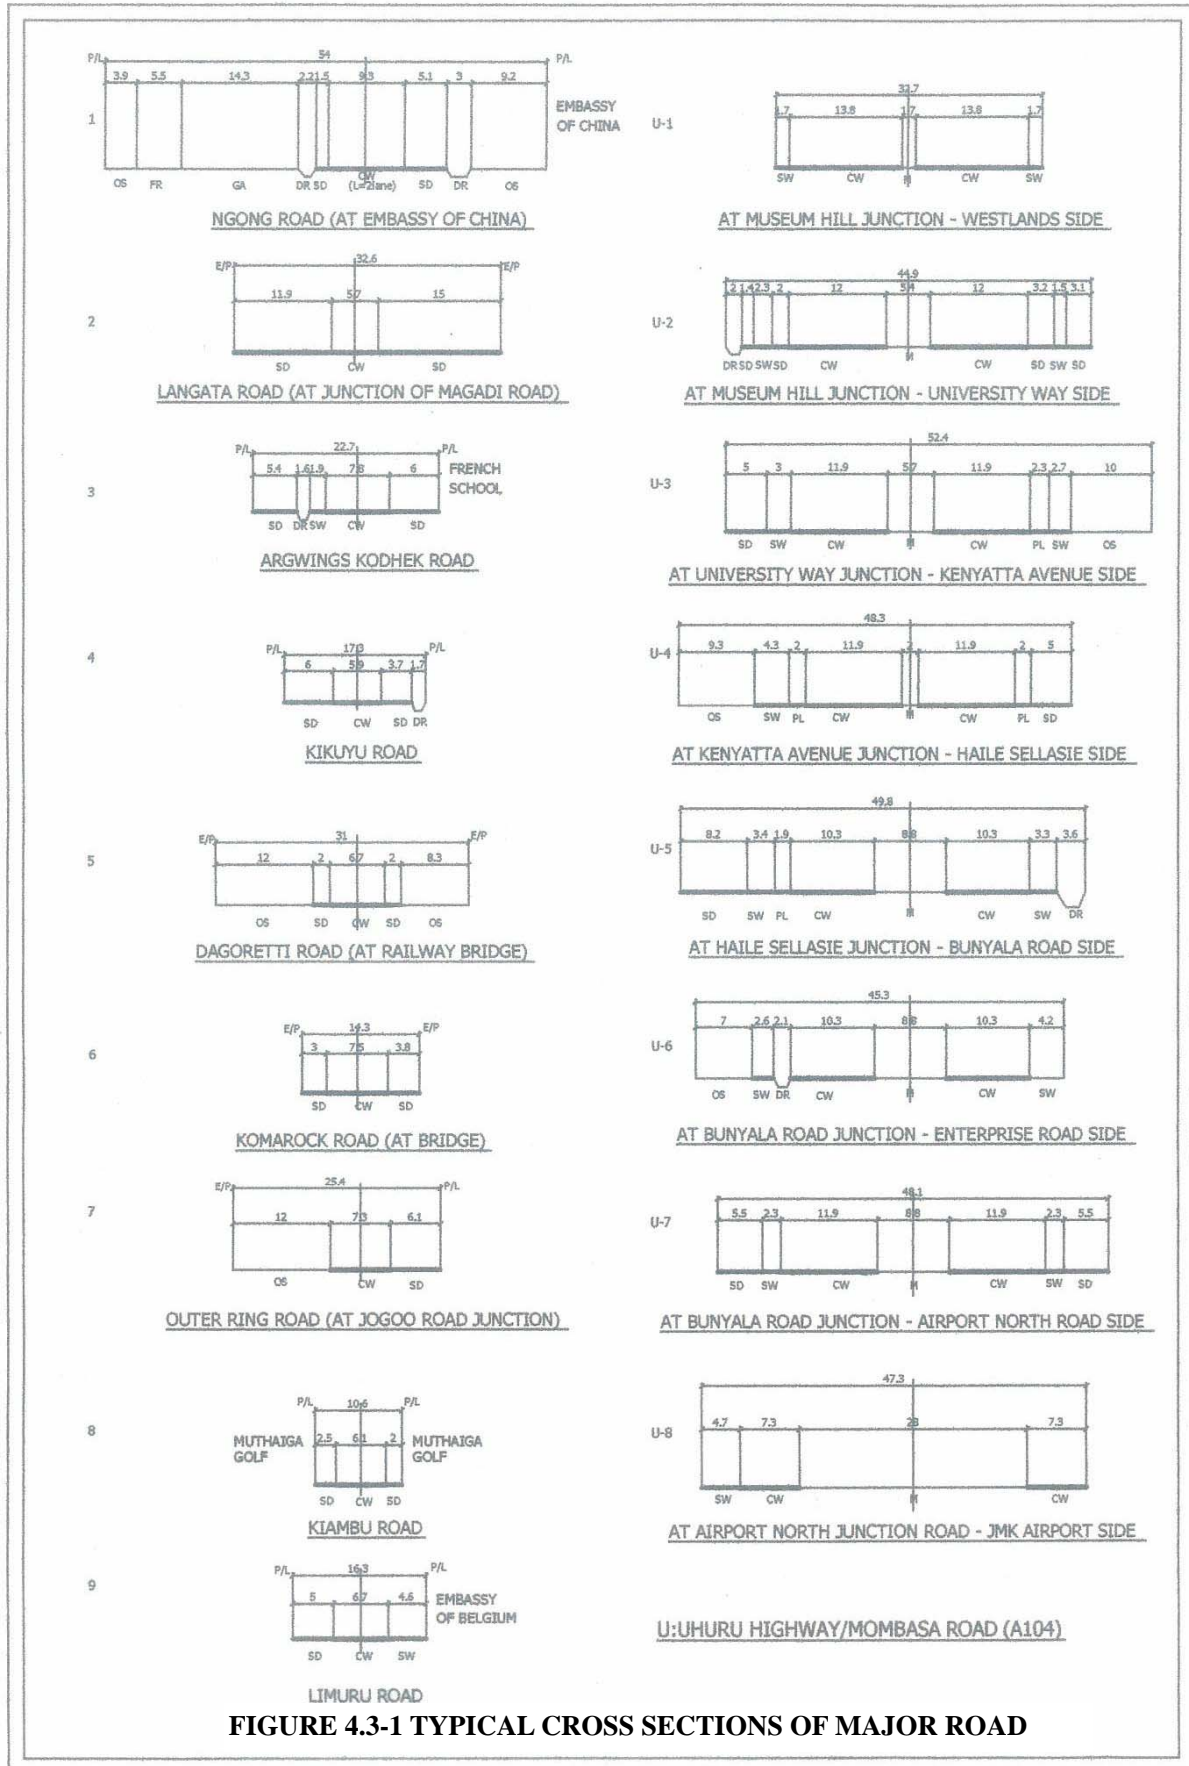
TYPICAL CROSS SECTIONS OF MAJOR ROAD
